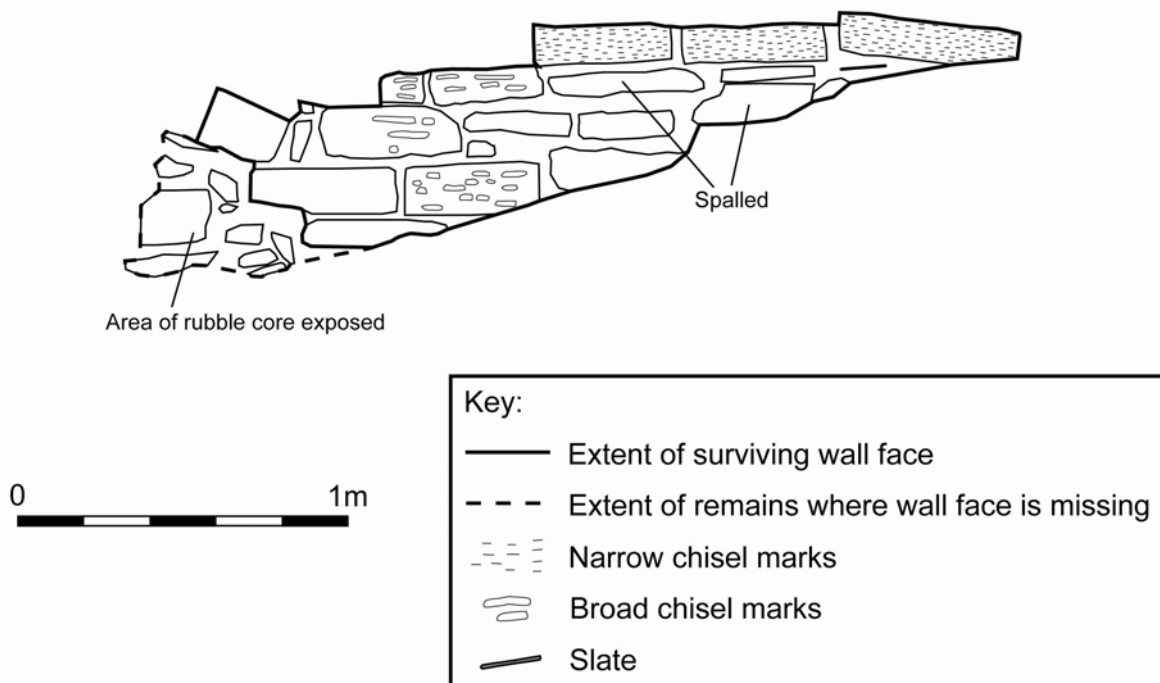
Structure 1, West Stair: Elevation a (East-facing revetment)
